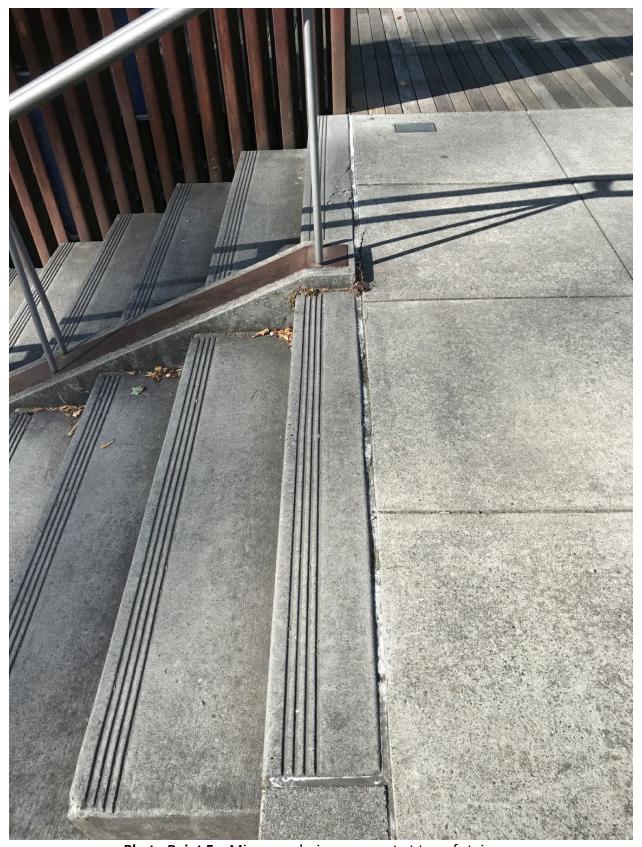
Minor cracks in pavement at top of staircase
